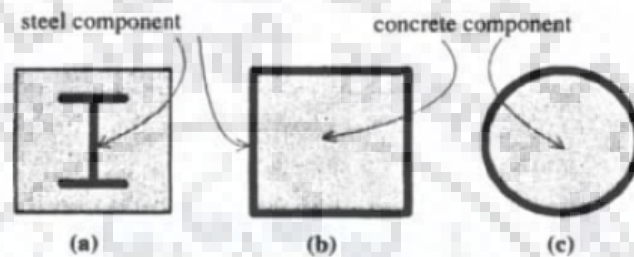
Composite column sections (Oehlers D.J., Bradford M.A., 1999)
